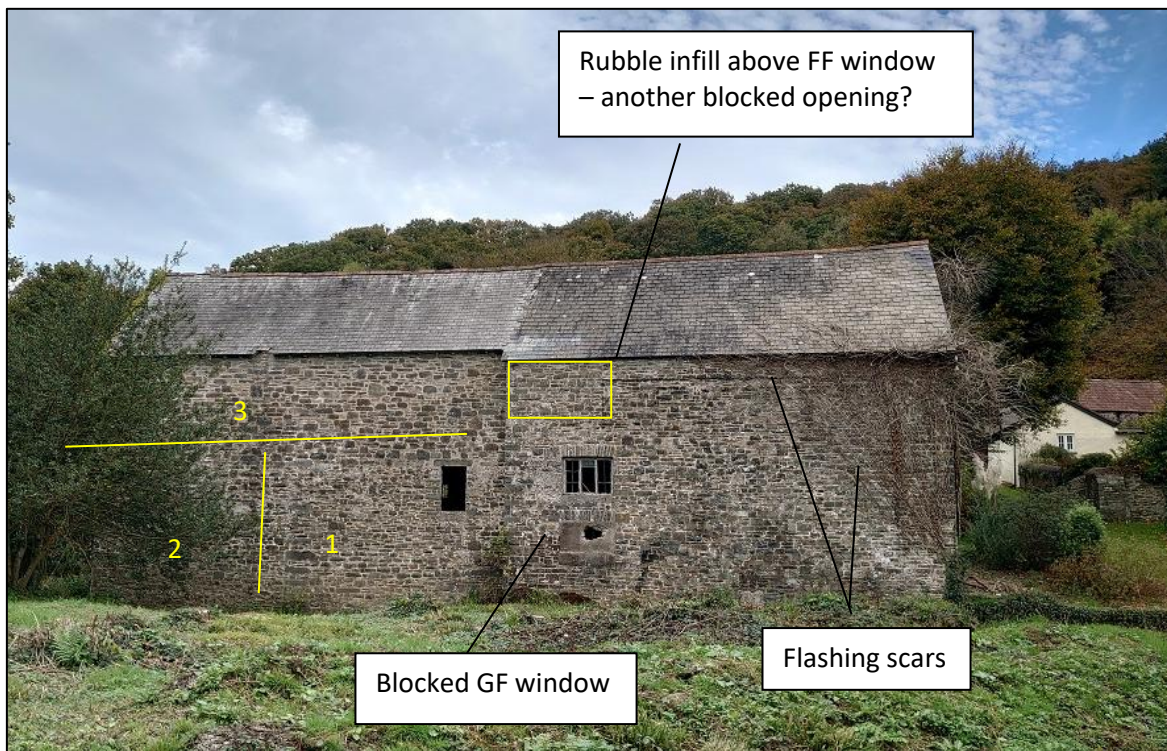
THE MILL BUILDING, THE STONEMWORK EVIDENCING STRUCTURAL PHASING; FROM THE SOUTH. THE FLASHINGS AND POTENTIAL BLOCKED WINDOW ARE ILLUSTRATED ON BUILDING 1. THE COMPLEX PHASING OF BUILDING 2'S SOUTH ELEVATION IS ALSO ILLUSTRATED.
